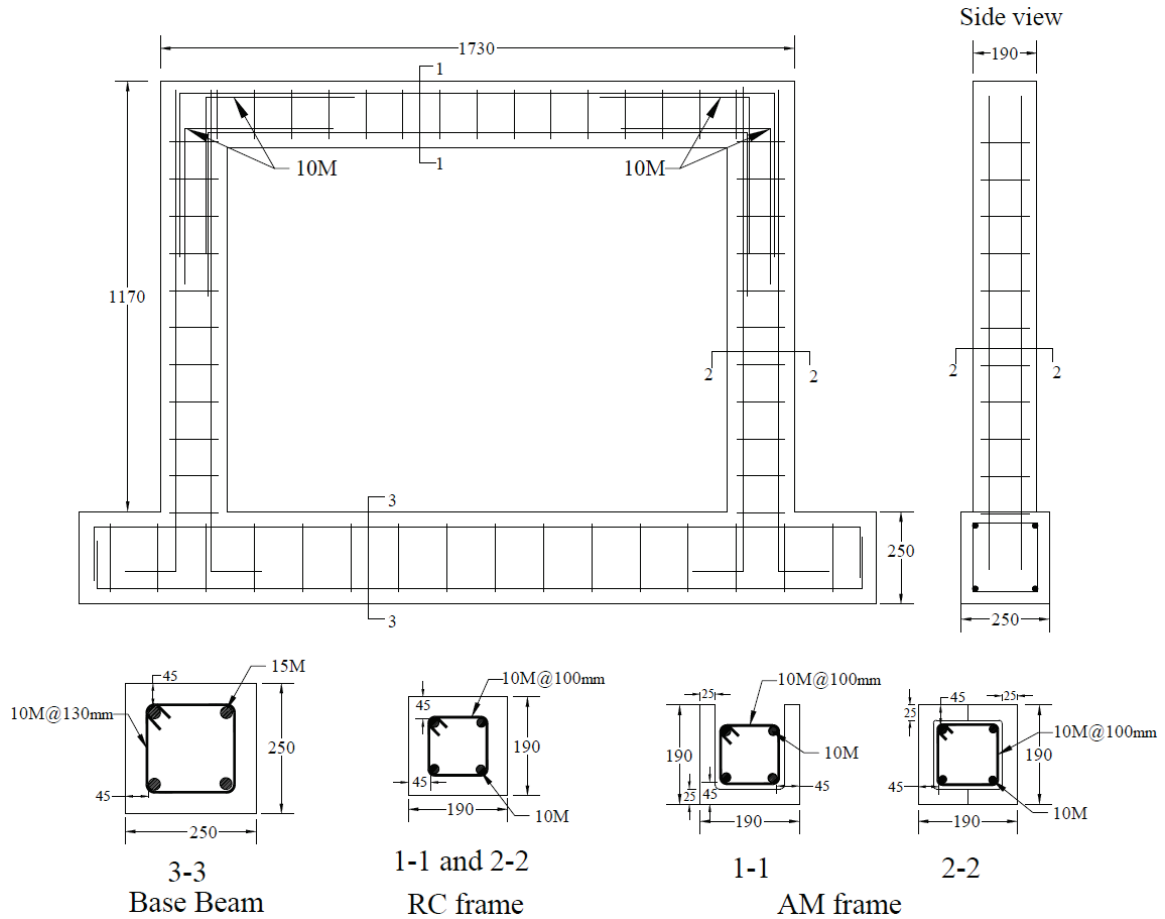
Reinforcement details of specimen frames (unit: mm)
